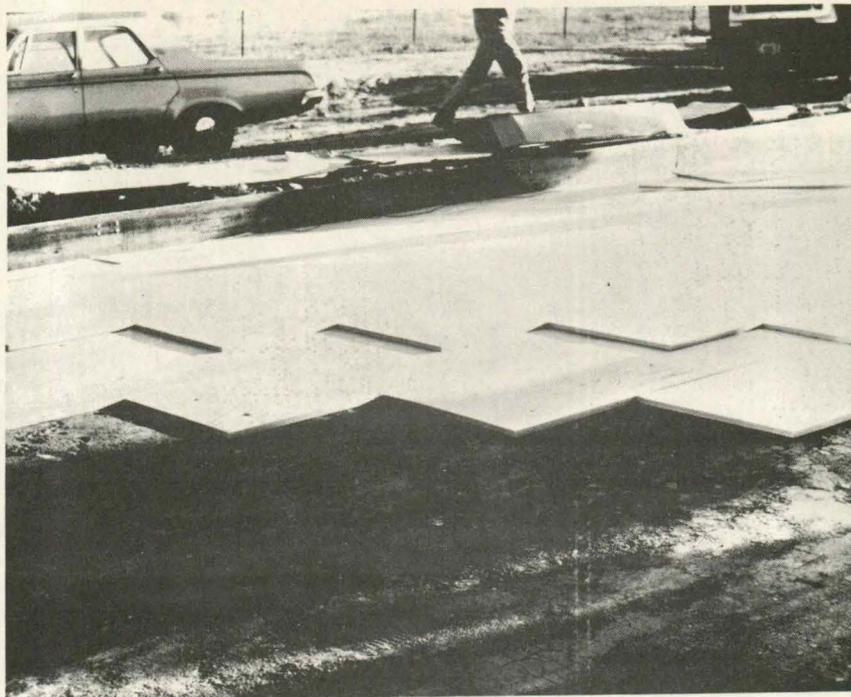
Two layers of 3/4" Styrofoam on the subgrade.
